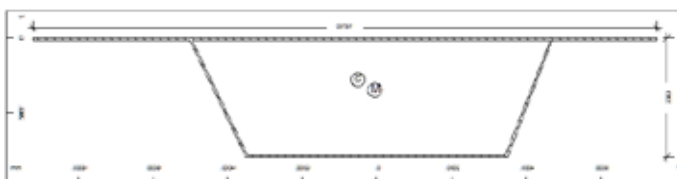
Simplified deck cross section (SOFiSTiK FEM model)
